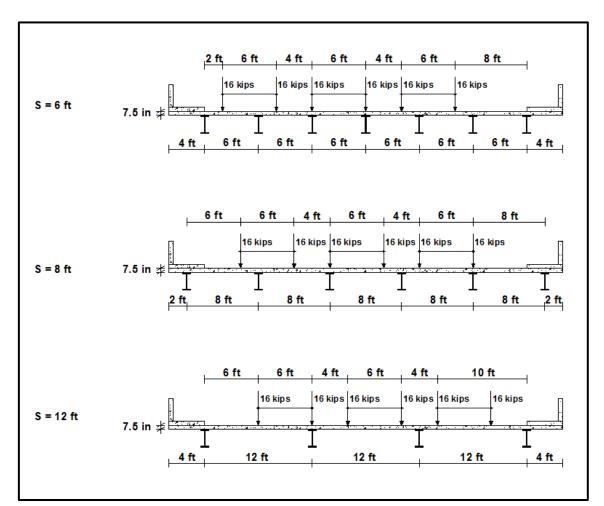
Typical Cross-Section of Three-Lane Bridges (Case 2SR) and the Critical Transverse Position of HS20 Trucks for the Different Girder Spacing Considered
